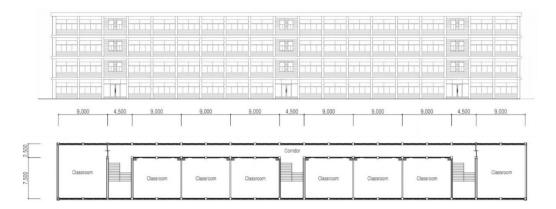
Standardized school building and classroom arrangement in 1975 (Lee, 2009).
